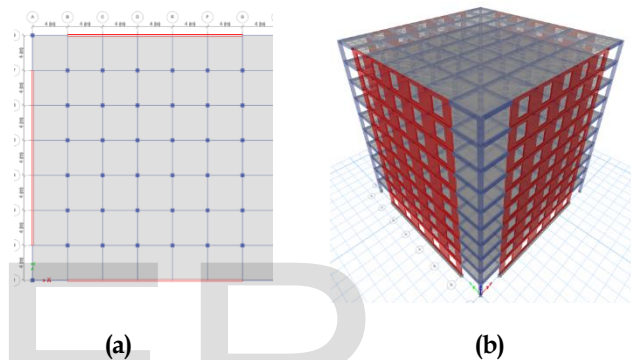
(a) Plan and (b) 3D model of CSW except corner
